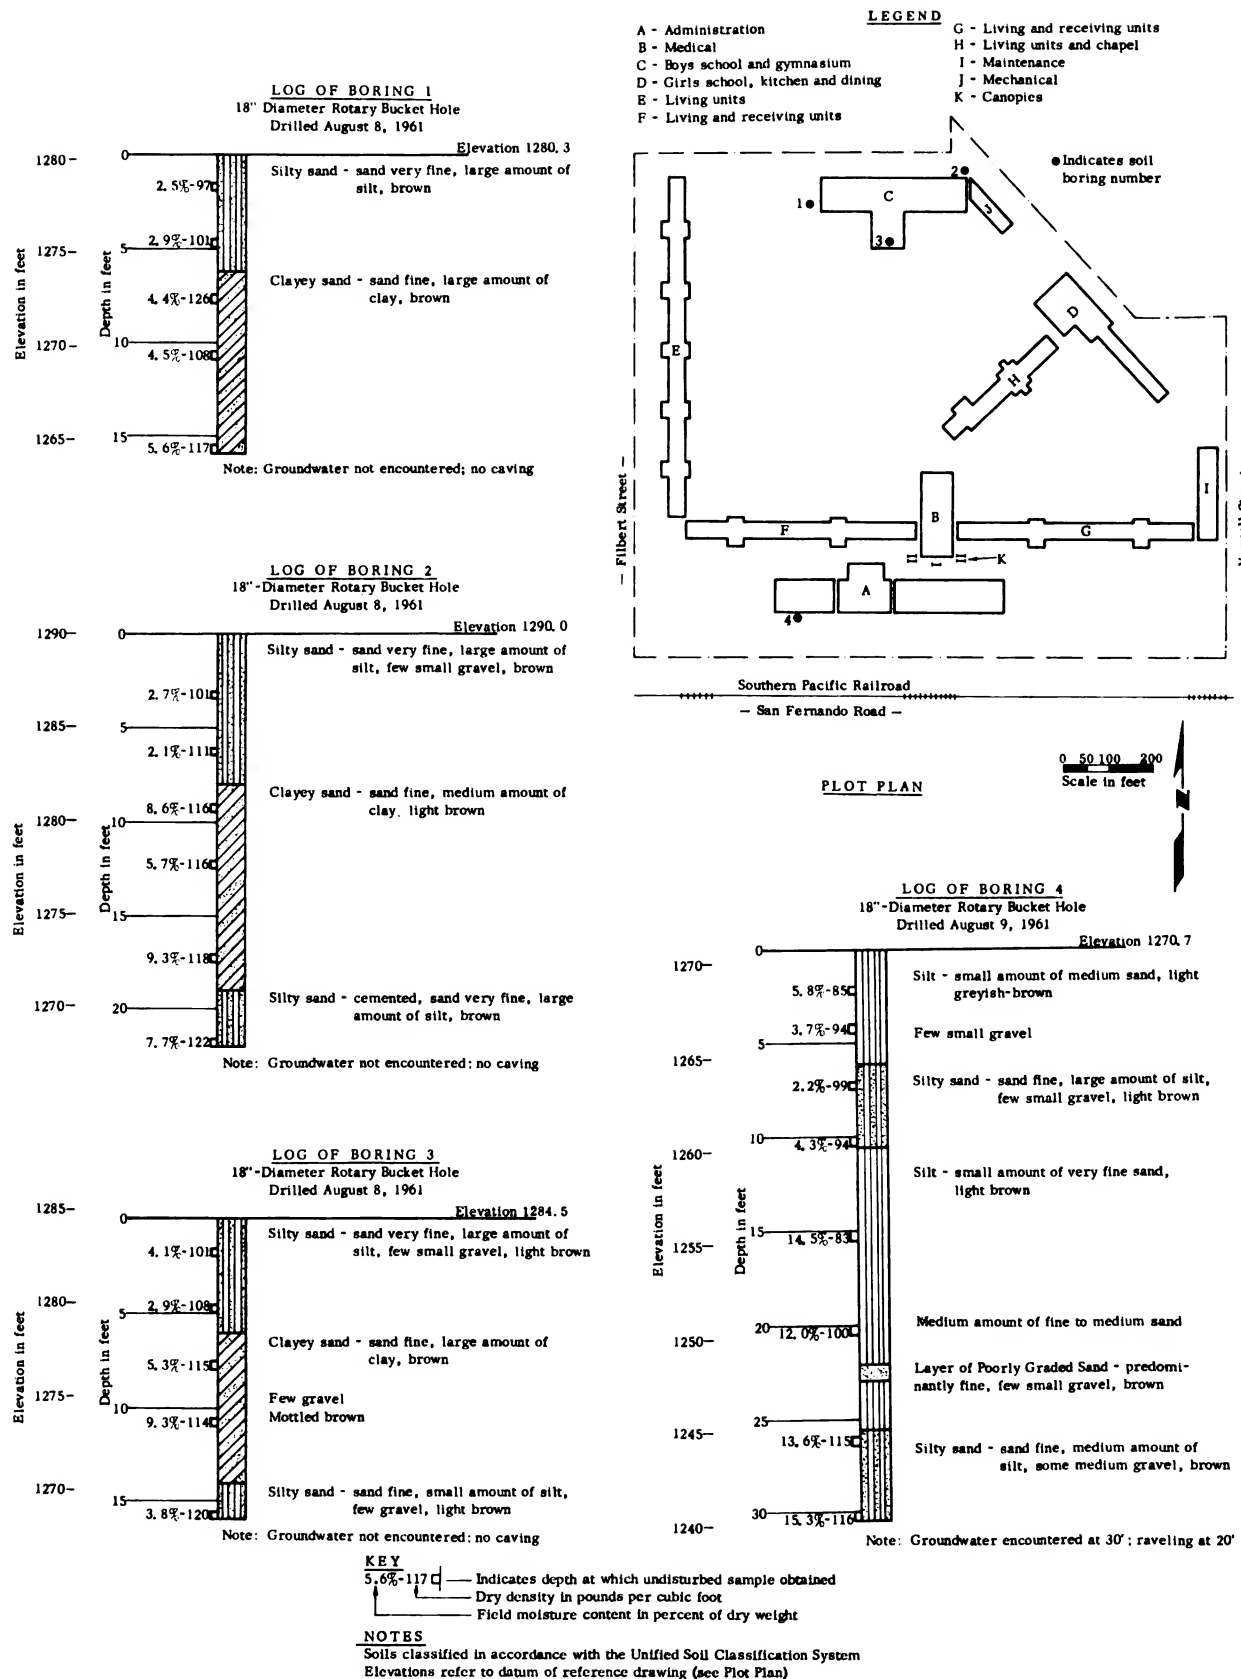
San Fernando Valley Juvenile Hall. Plot plan and log of borings.
